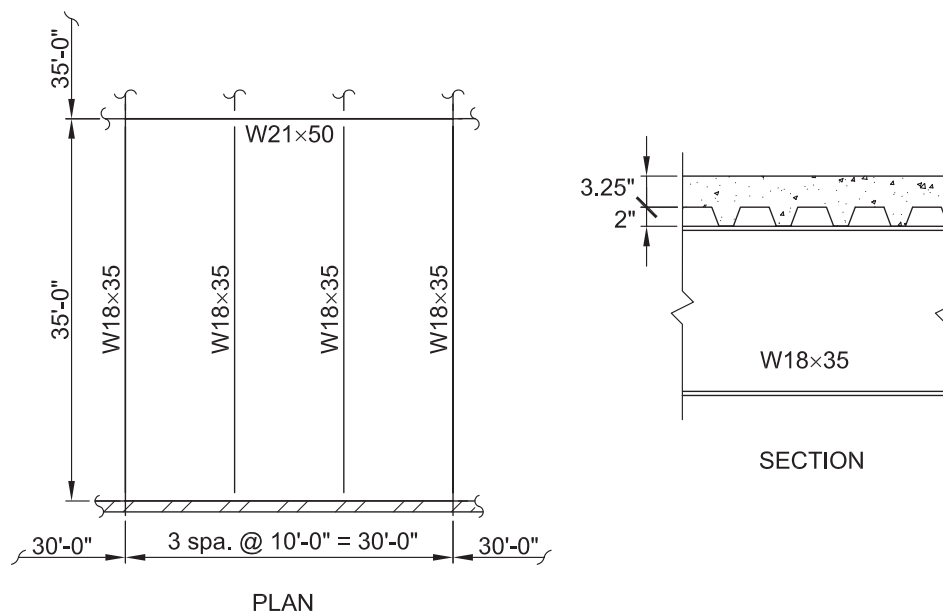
Exterior bay floor framing details for Example 4.1.
